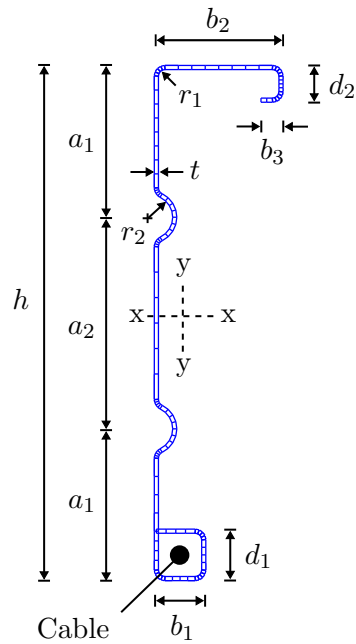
Reference cross-section profile of the studied prestressed cold-formed steel beam; external dimensions are shown.
